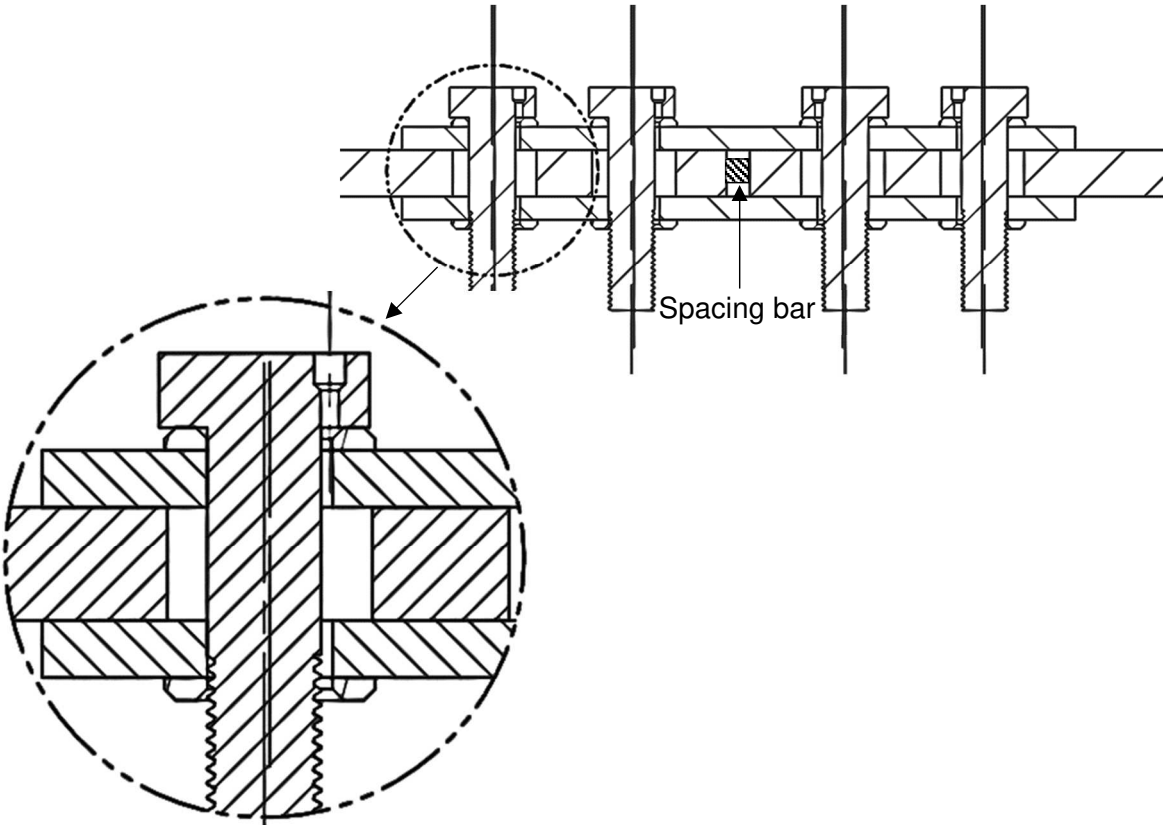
Cross-section of assembly with holes Ø36 mm in centre plates. Detail indicating that the bolts are bearing directly on the steel cover plates. Nuts are not shown.
